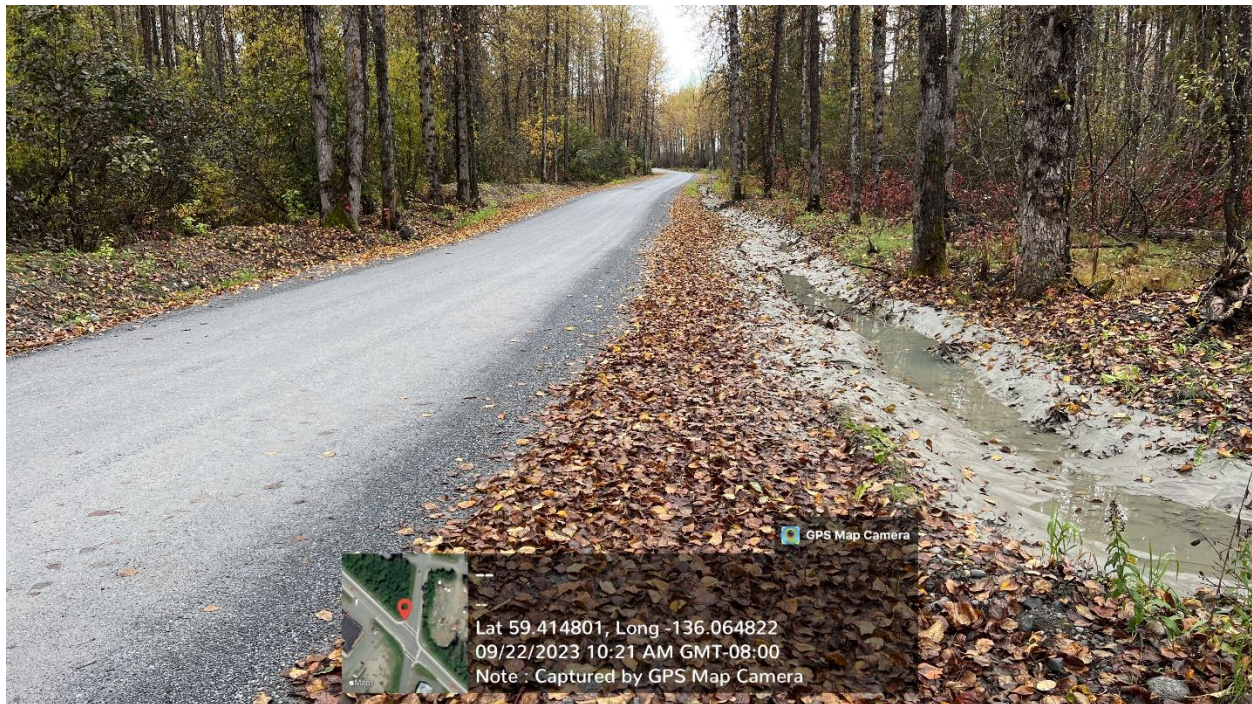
Phase 1 gravel surfacing and beginning of ditch reconditioning work after Herman Creek crossing, photo facing towards end of road.
